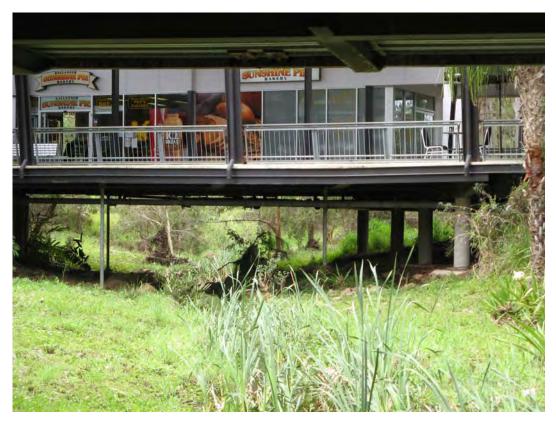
Hays Inlet Catchment, Bridge and Shop, School Road
